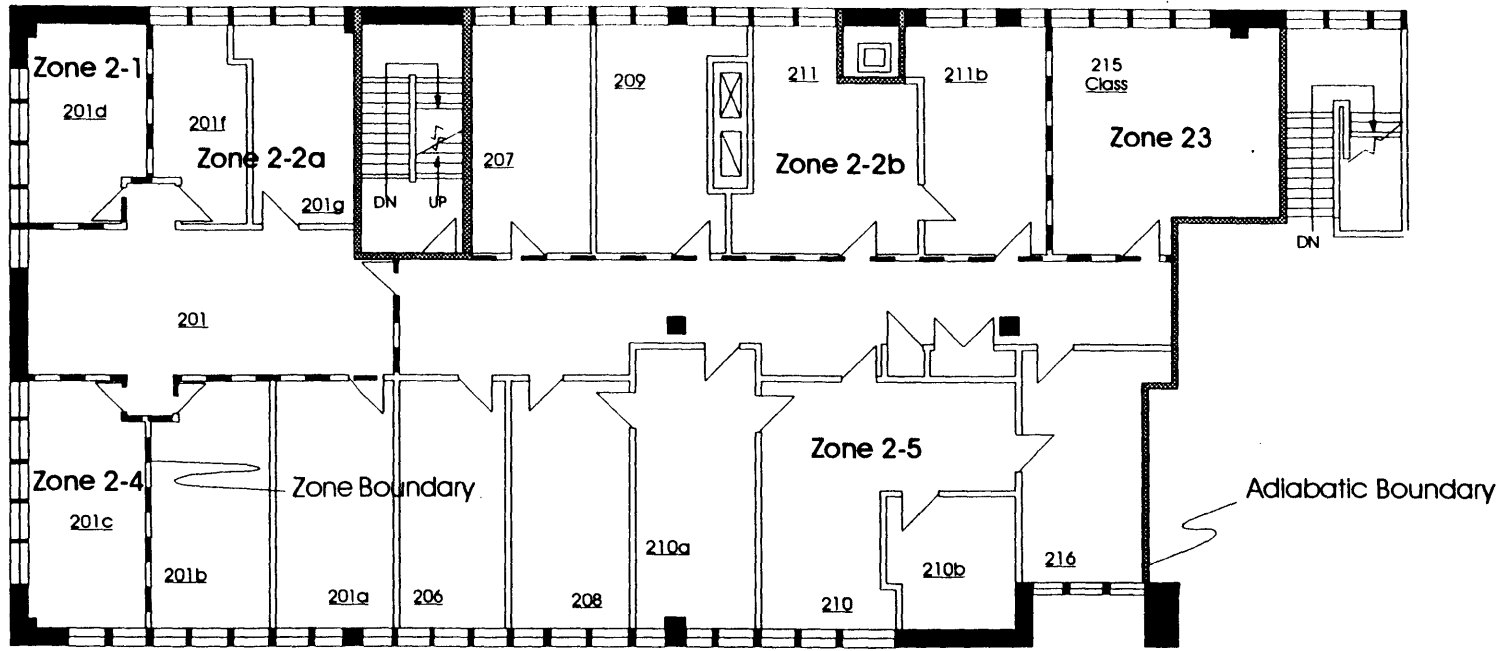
Building E51 - Second Floor Level Zoning Option 2B
